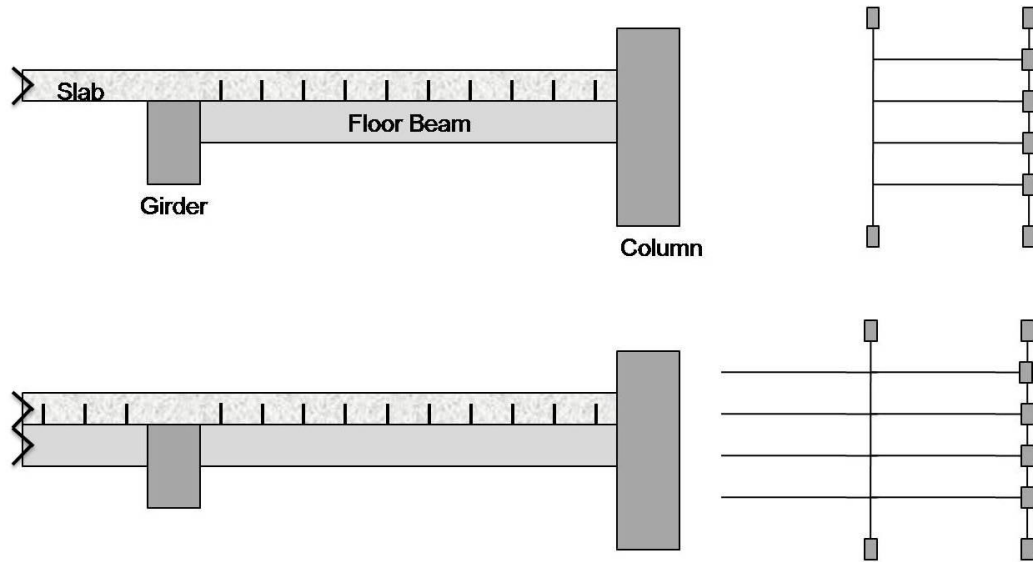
Schematic of asymmetric floor framing (top) and symmetric floor framing (bottom) relative to the girder.
